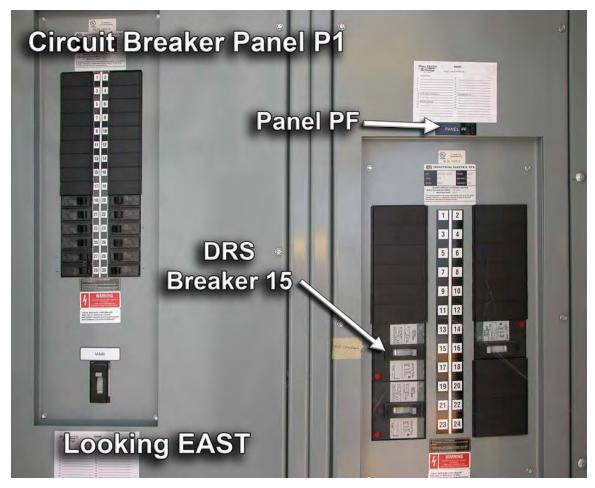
Circuit Breaker Panel P1. East close-up view of Panel PF and Debris Removal System (DRS) Breaker 15.
